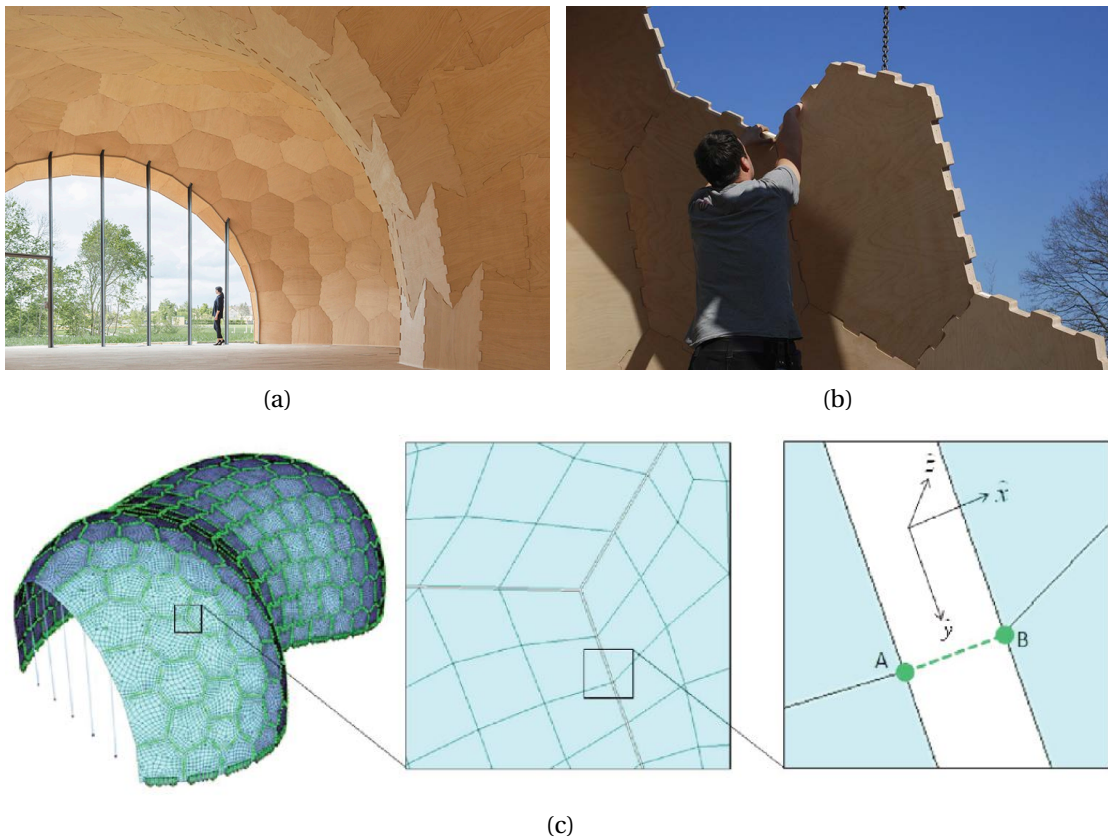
Landesgartenschau Exhibition Hall, Schwäbisch Gmünd, Germany, 2014: (a) Exterior view (b) Screwed finger joints (c) Finite element model in which the semi-rigid connections were modelled with springs connecting two nodes at the opposite sides of neighbouring panels. Reproduced from [53].
